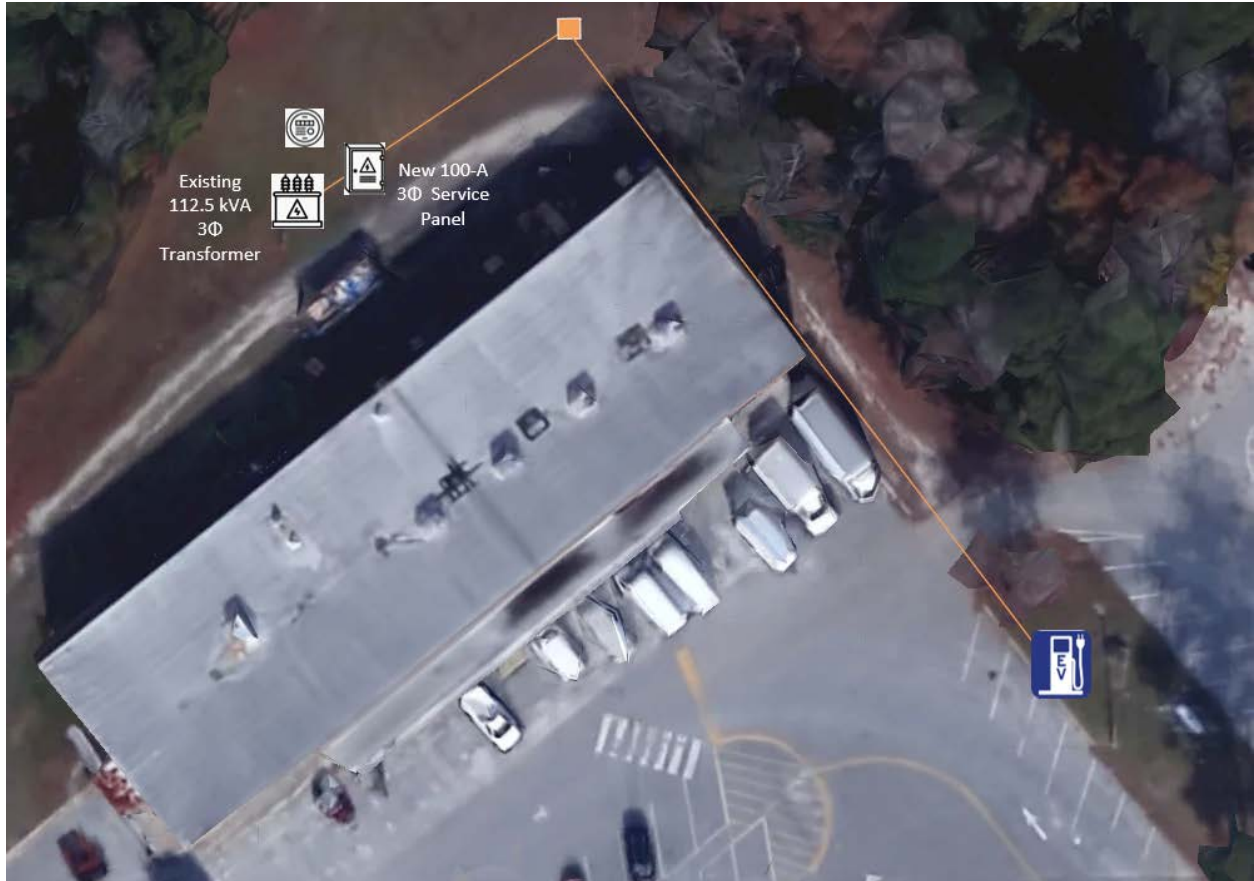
Recommended configuration for Building 88 EVSE and electrical service
